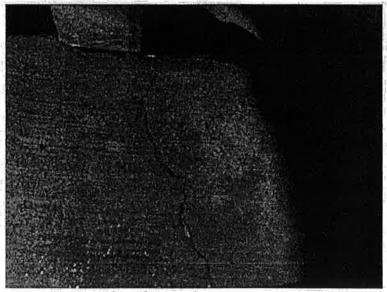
Expansion/Contraction Cracks at Elevated Concrete Deck.
